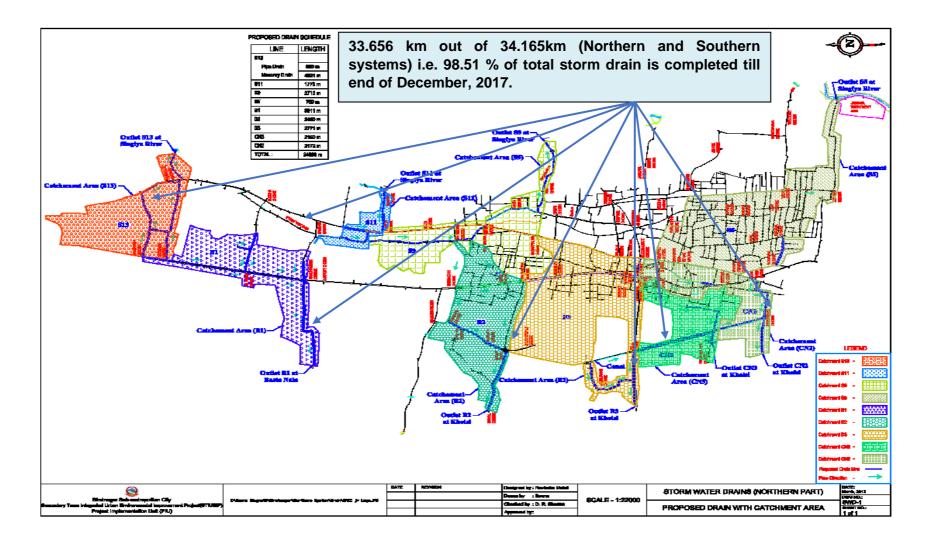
PROPOSED STORM WATER DRAINS IN BMC (Northern Drainage System)
